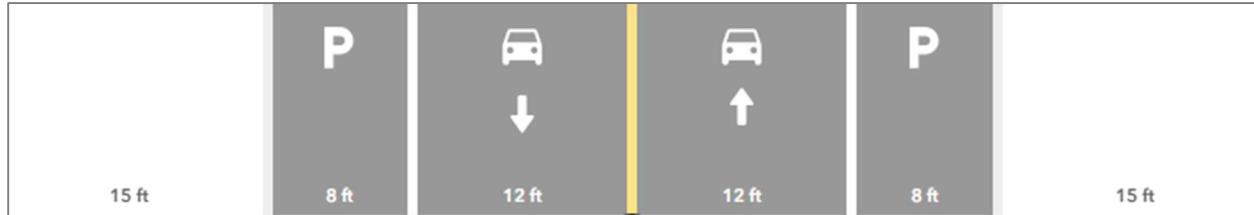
Existing 47th Street cross-section (Baltimore Avenue – Kingsessing Avenue)
